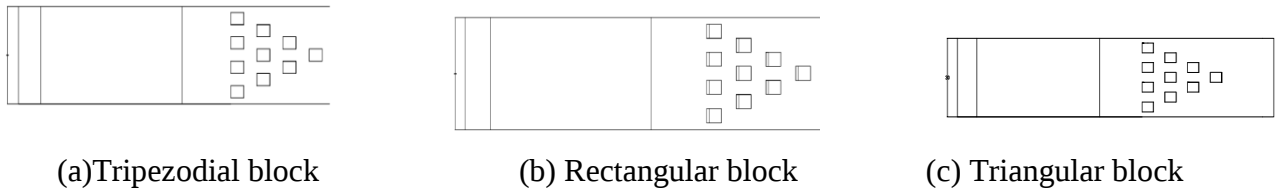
Model Arrangement of Standard USBR Baffle Blocks top view
